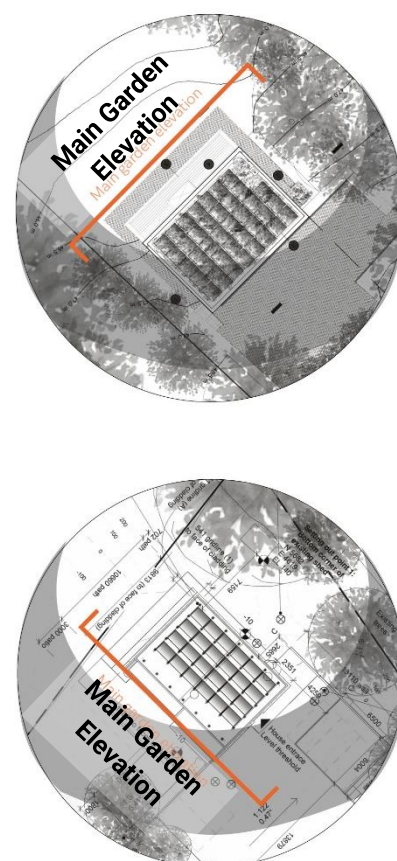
Roof plan of Lark Rise, 175 m² (above) and Brambles, 150 m² (below), with the sun path indicated in light grey.
